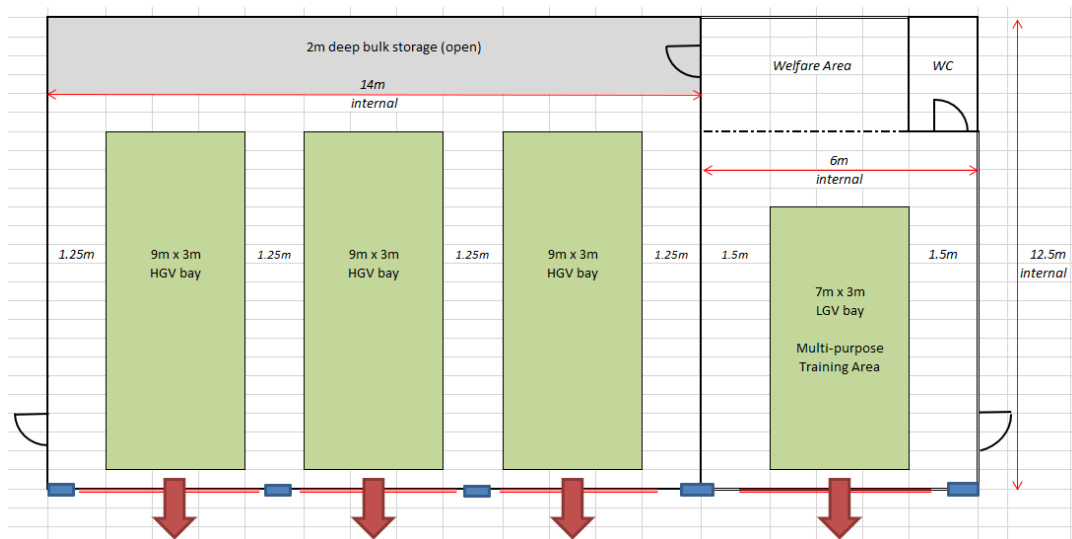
Plan Drawing Sketch of Letterkenny Brigade Standalone Extension
